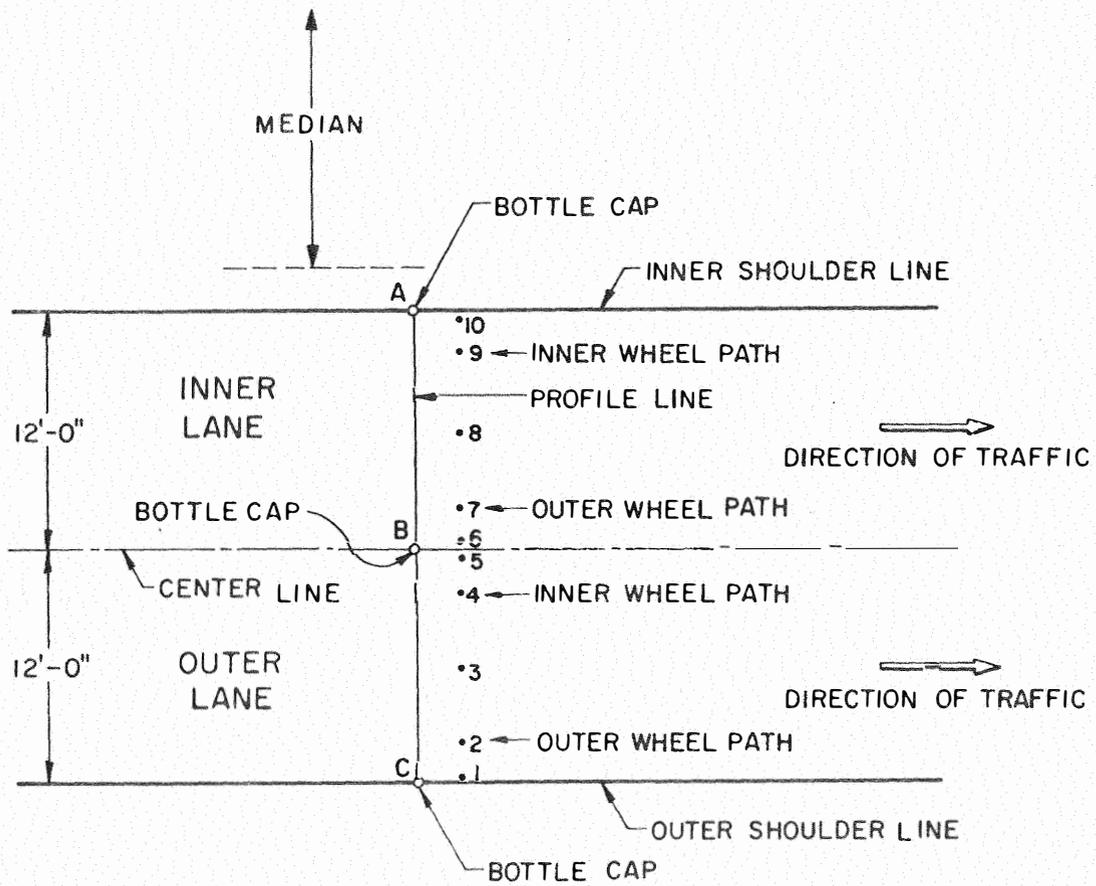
Layout of Transverse Test Point Locations at a Test Site
